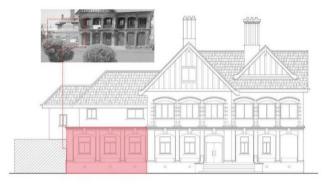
South Elevation Addition with Historic Glass Flower Room
